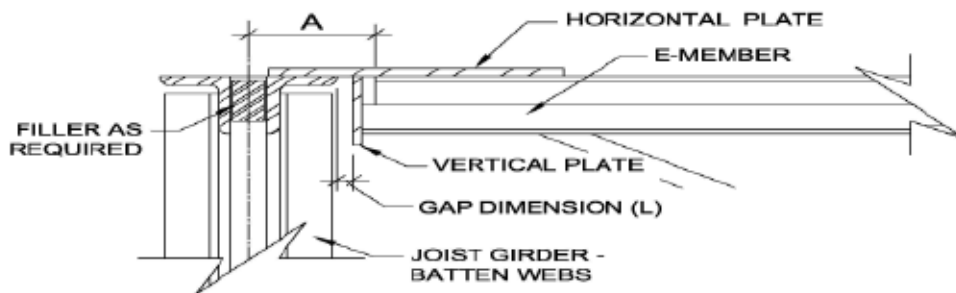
Flush Joist Seat Components (Joist Girder)
